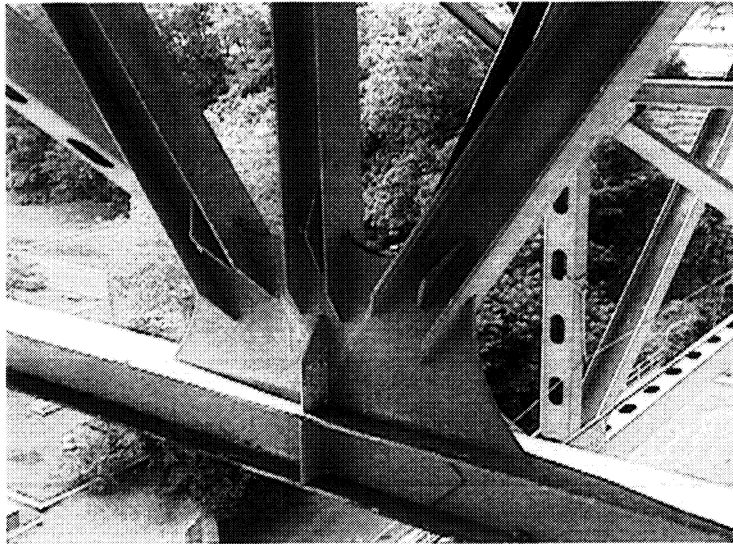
Longitudinal Stiffeners at Floor Truss Connections
